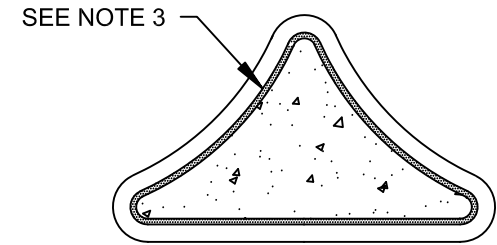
TOWN OF GILBERT STANDARD DETAIL	BIKE LANE AT RIGHT TURN LANE	REVISED 5/13/2008	DETAIL NO. 303
